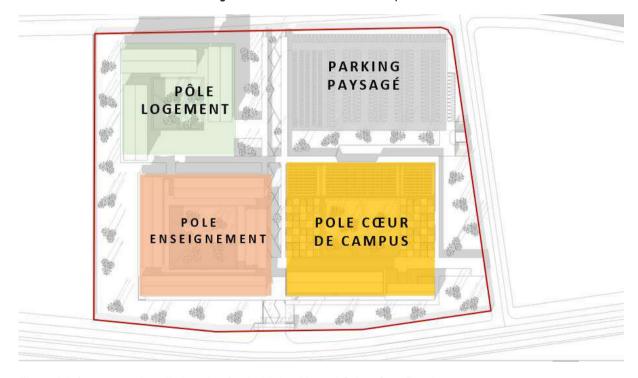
Infrastructure installation plan for the Higher Normal Schoolfrom Parakou
